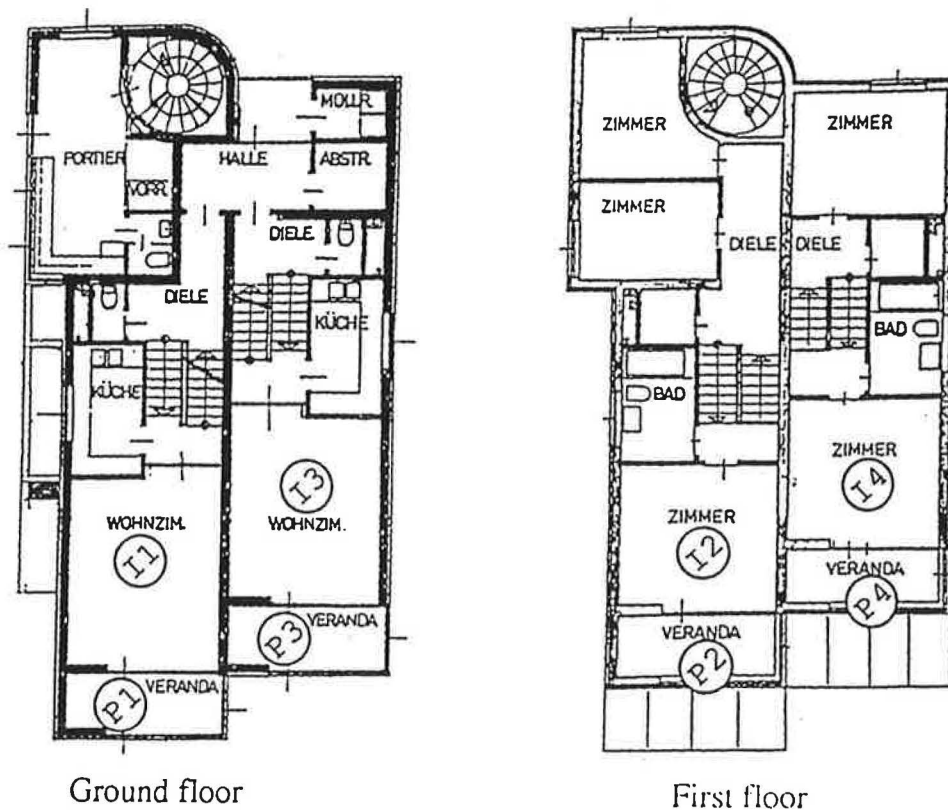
Schematic illustration of ground floor and first floor of research facility.
